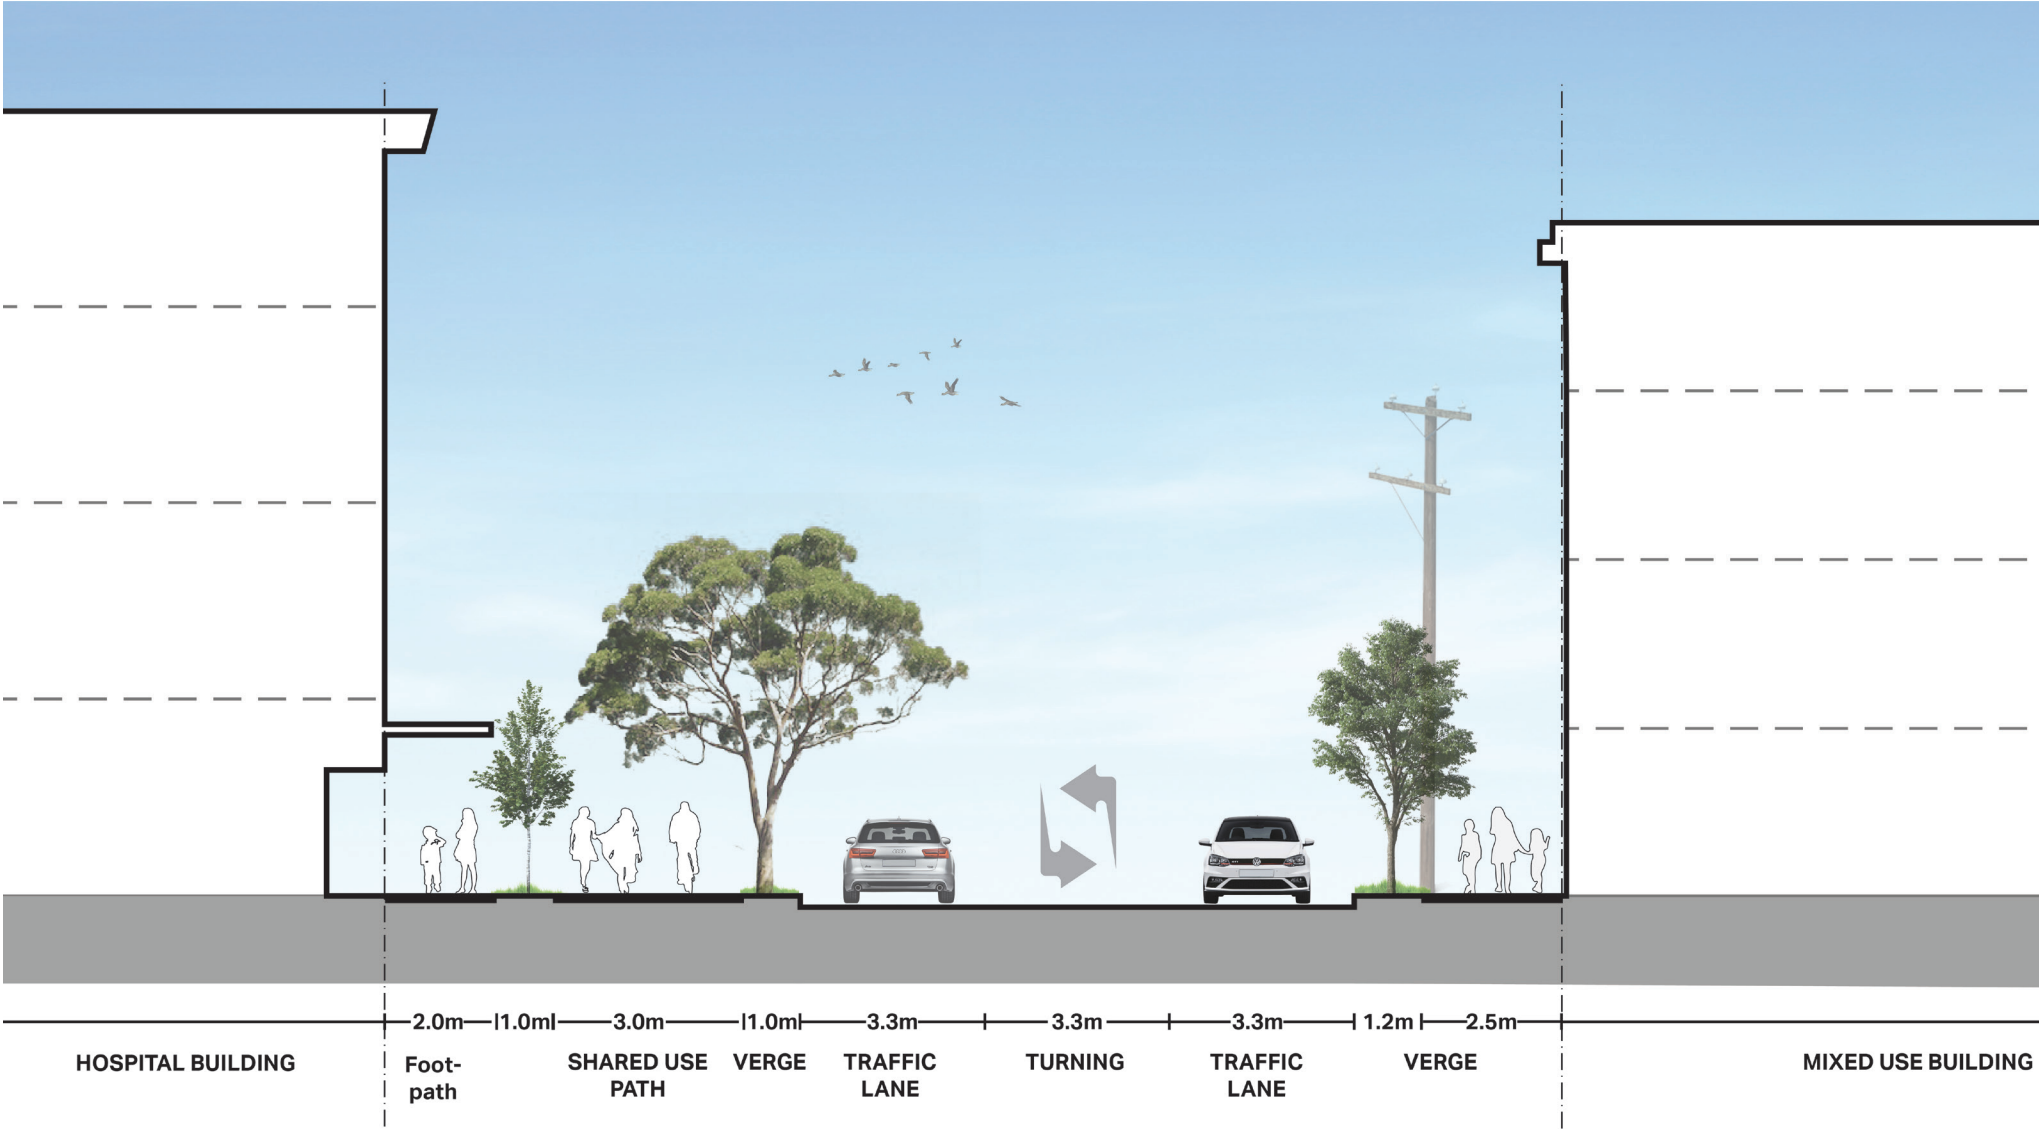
Furlong Road 'High Street' - Typical Cross Section (Option 1)
